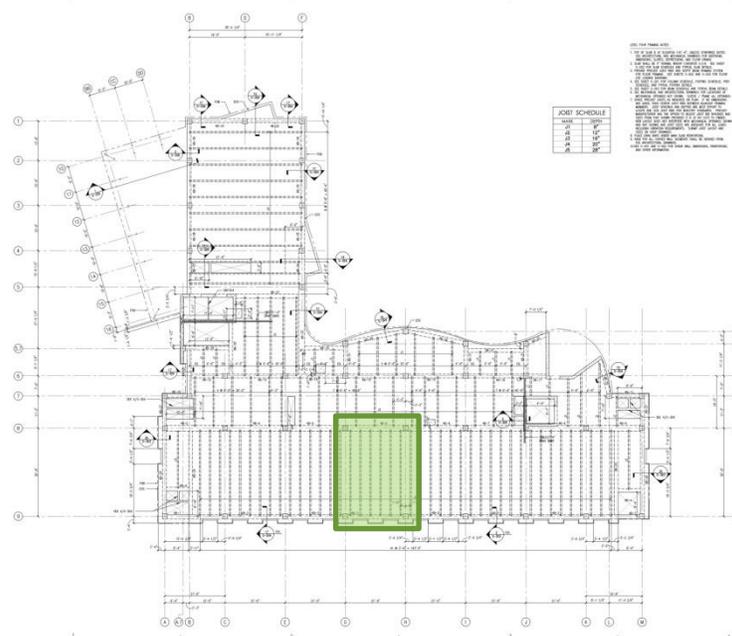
Floor plan indicating the typical bay used for preliminary hand calculations for the one way gravity design.
